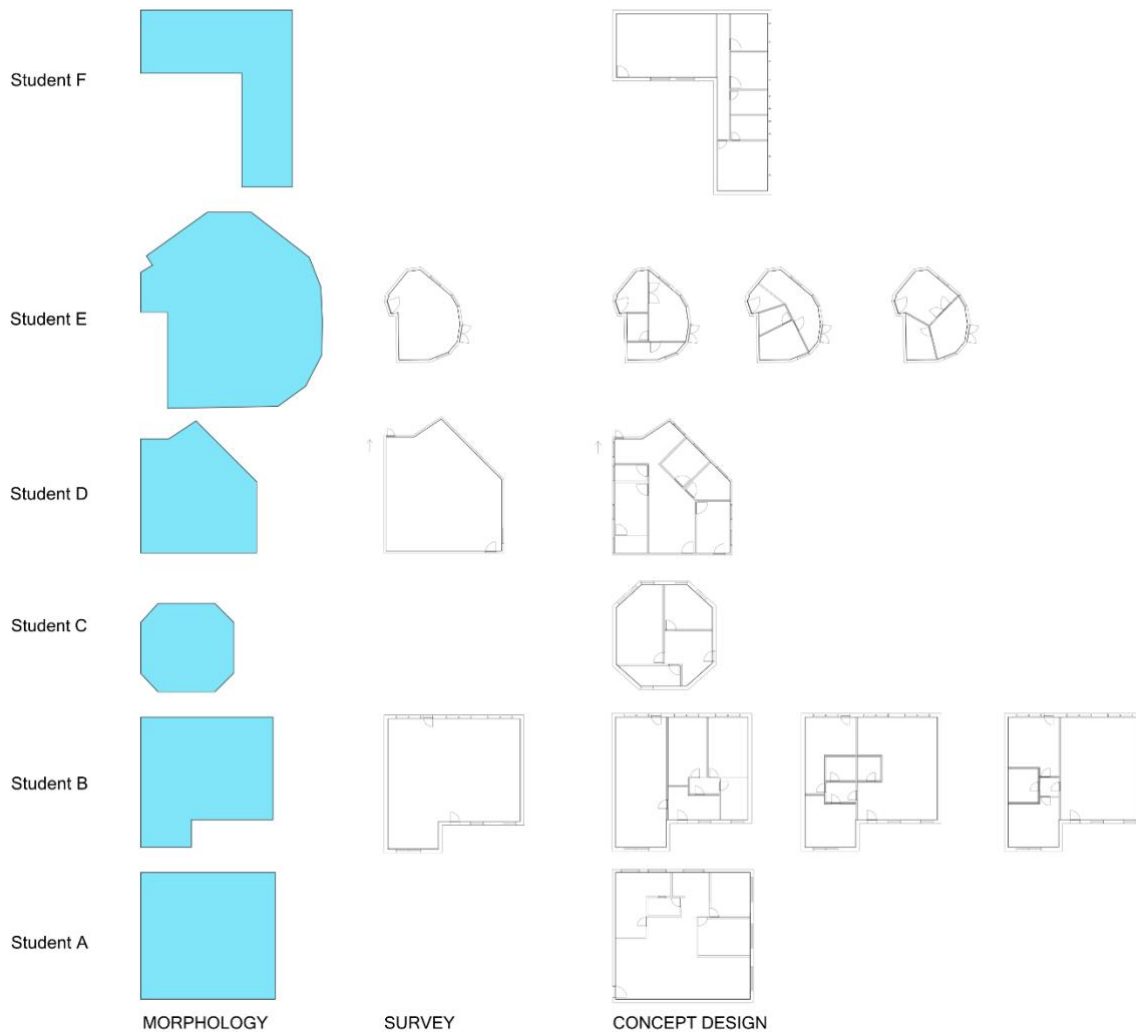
Survey morphology to existing space plan and possible spatial subdivision
